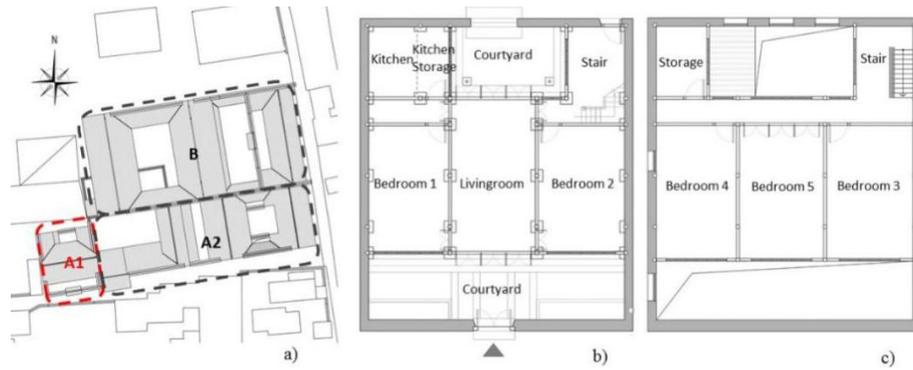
a) B: The North side courtyard, A1 and A2: Southwest side courtyard; b) First floor plan of A1; c) Second floor plan of A1
